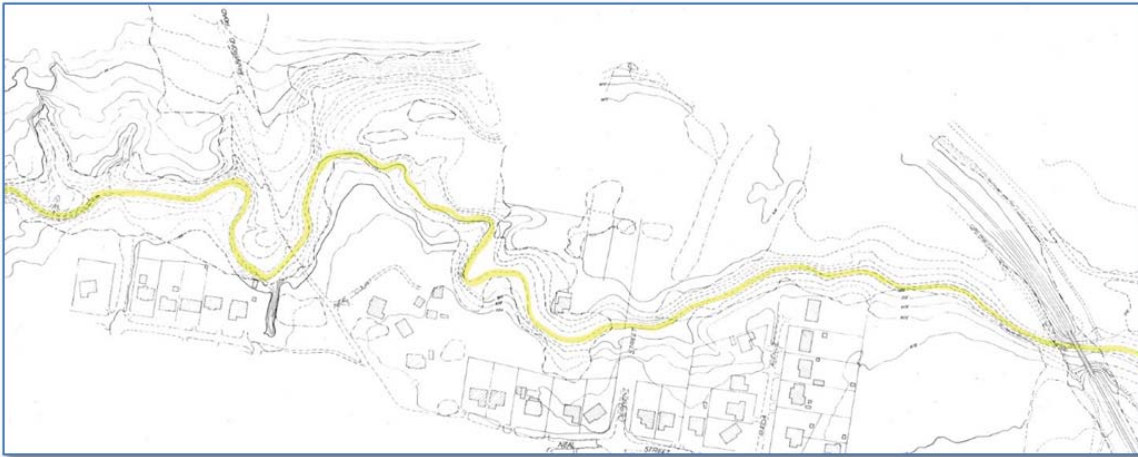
Plan of Dandenong Creek at the project site prior to channelization and piping in the 1960s (from Dandenong Valley Authority, 1966).
